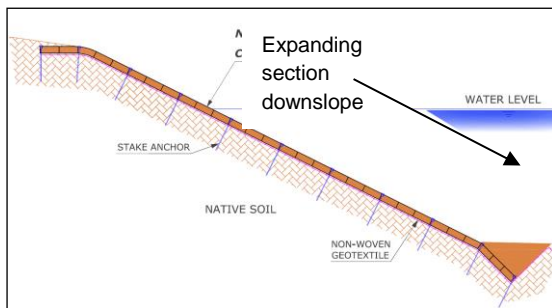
SECTION VIEW EXPANDING SECTION DOWNSLOPE
